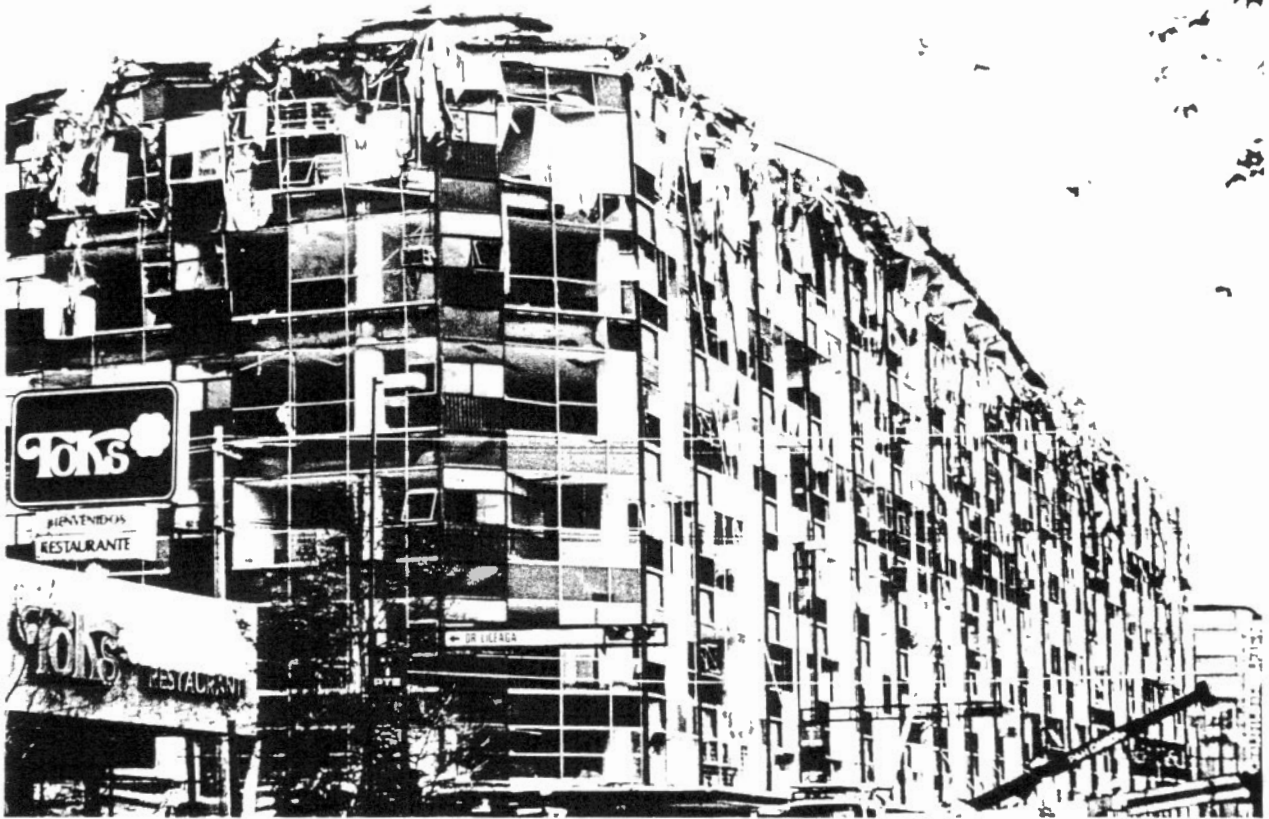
and 6.17b Eight Storey Flat Plate Structure with Collapsed Top Storey
